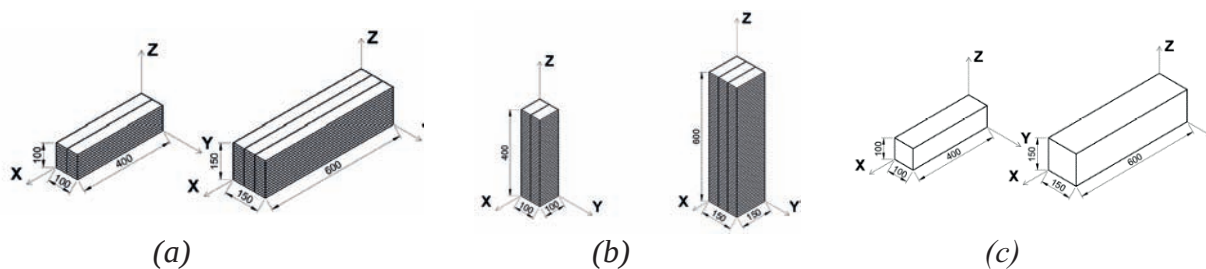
Geometric dimensions of concrete fragments for determining the tensile strength of concrete (R_{bt}), made fragments by layer-by-layer horizontal extrusion of concrete: a) - specimens for flexural tensile tests under loading perpendicular to the layers of the seal; b) - specimens for flexural tensile tests under loading parallel to the layers of the seal; c - control specimens made by traditional technology
